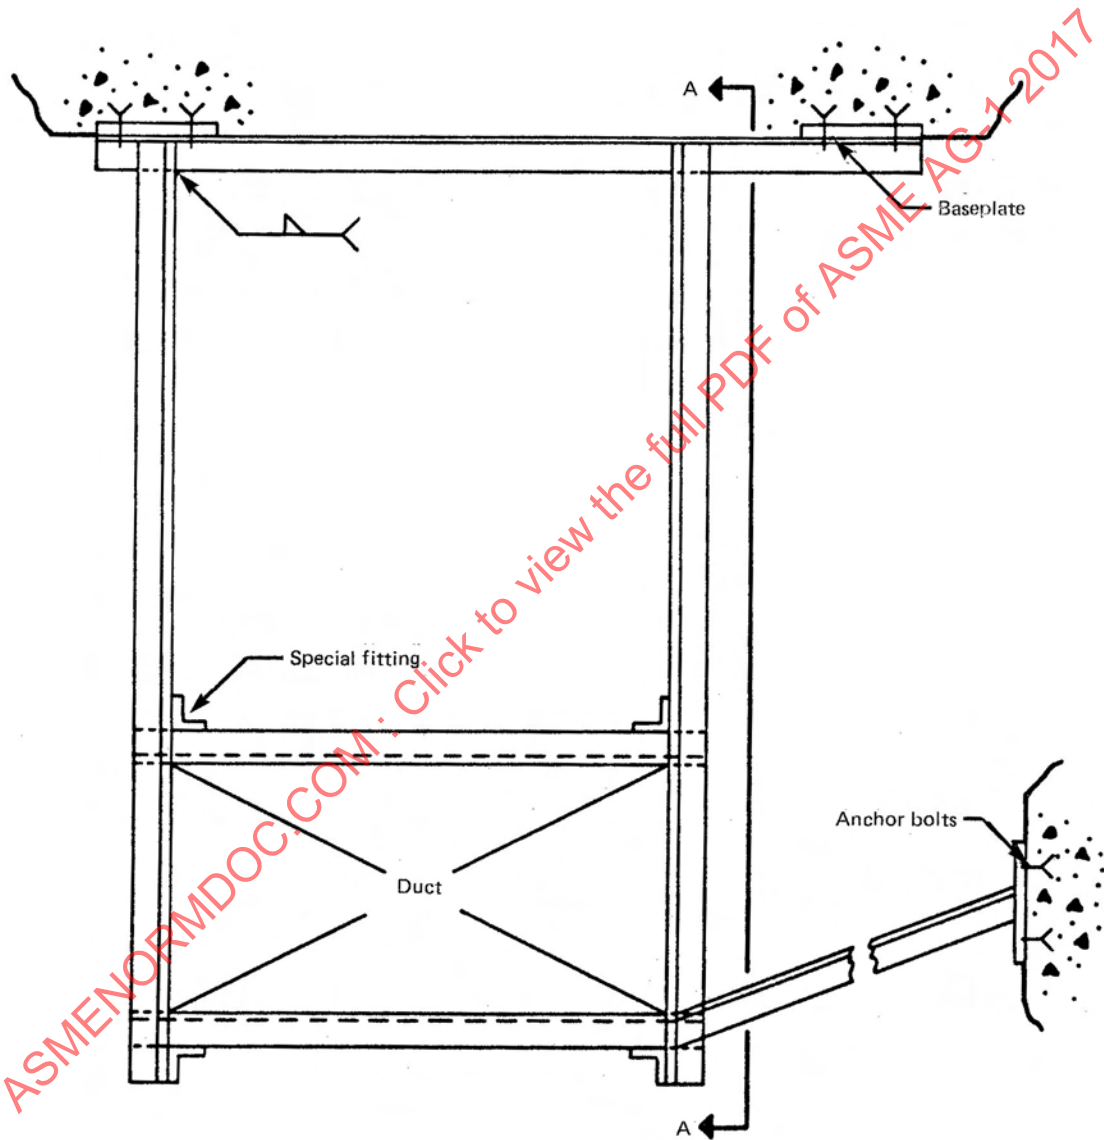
TYPICAL DUCT SUPPORT AS-BUILT
